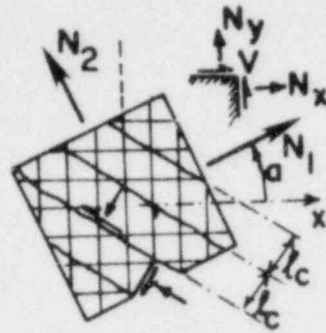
Diagonally cracked reinforced concrete element subjected to in-plane forces (Ref. 9).
